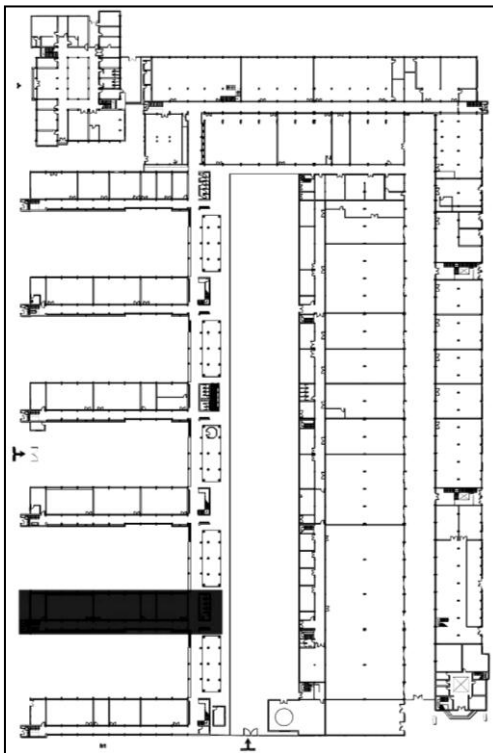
Plan for the Faculty of Engineering, where the Department of Architecture is shaded.
